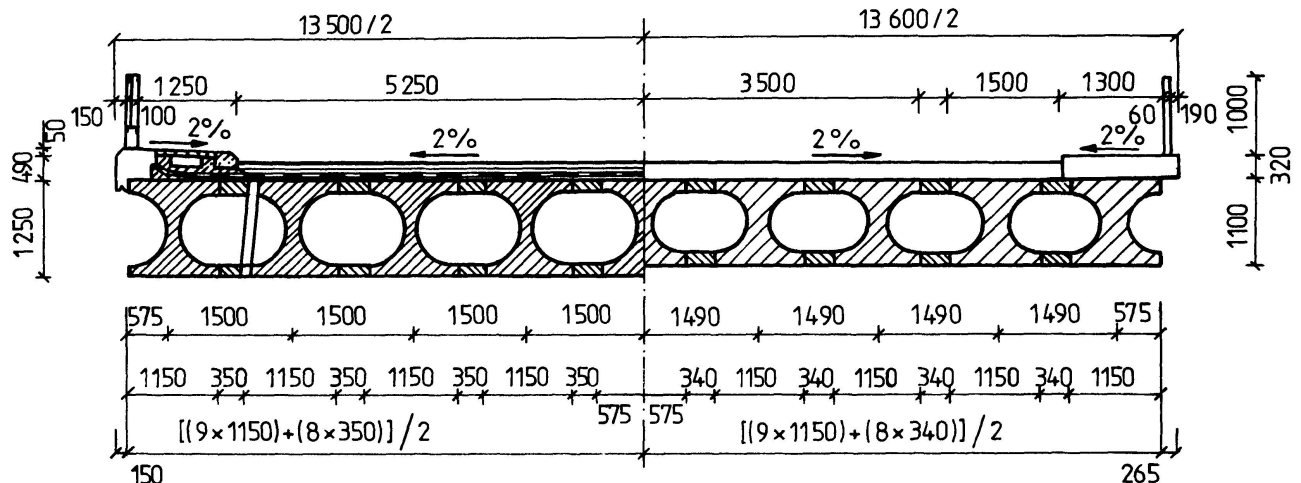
Crossection of the bridge near H. Hričov and K. Lhota
